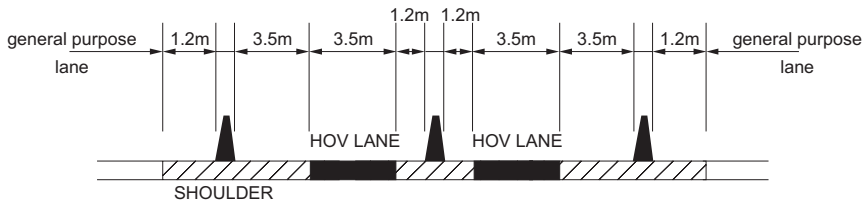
Barrier Separated Two-Way Cross Section
